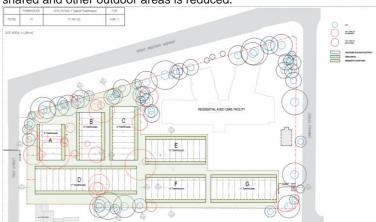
Example of multi dwelling housing proposal and massing (Source: Group GSA)
